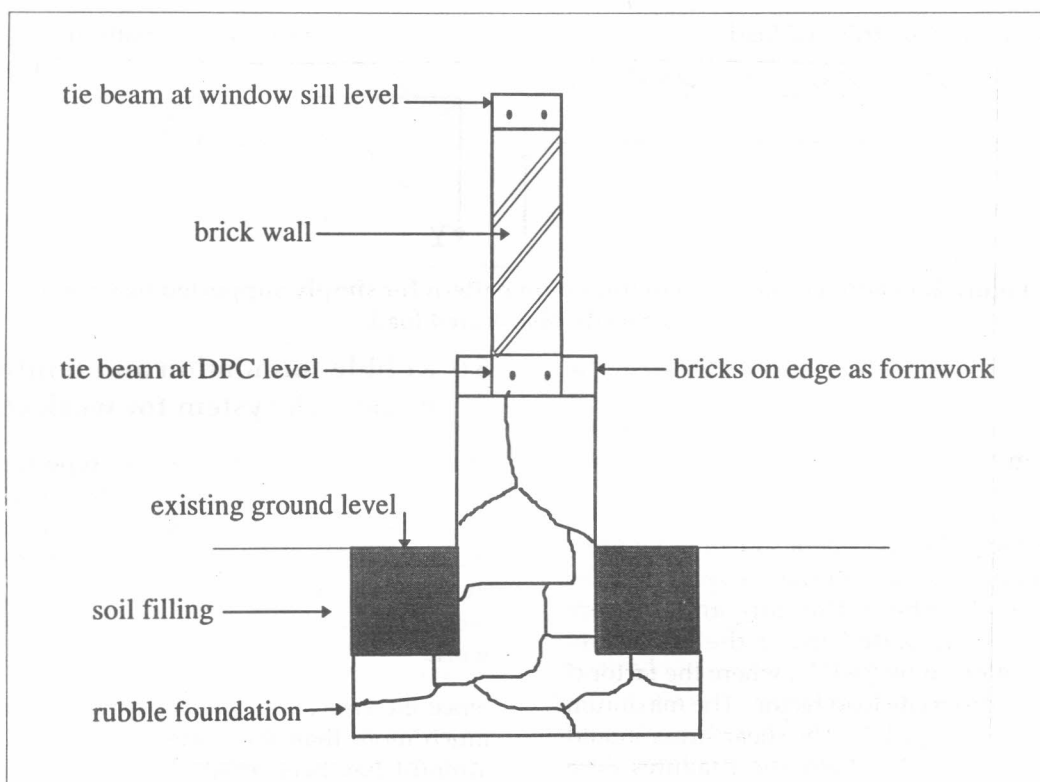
Rubble foundation with tie beams at DPC and window sill levels
